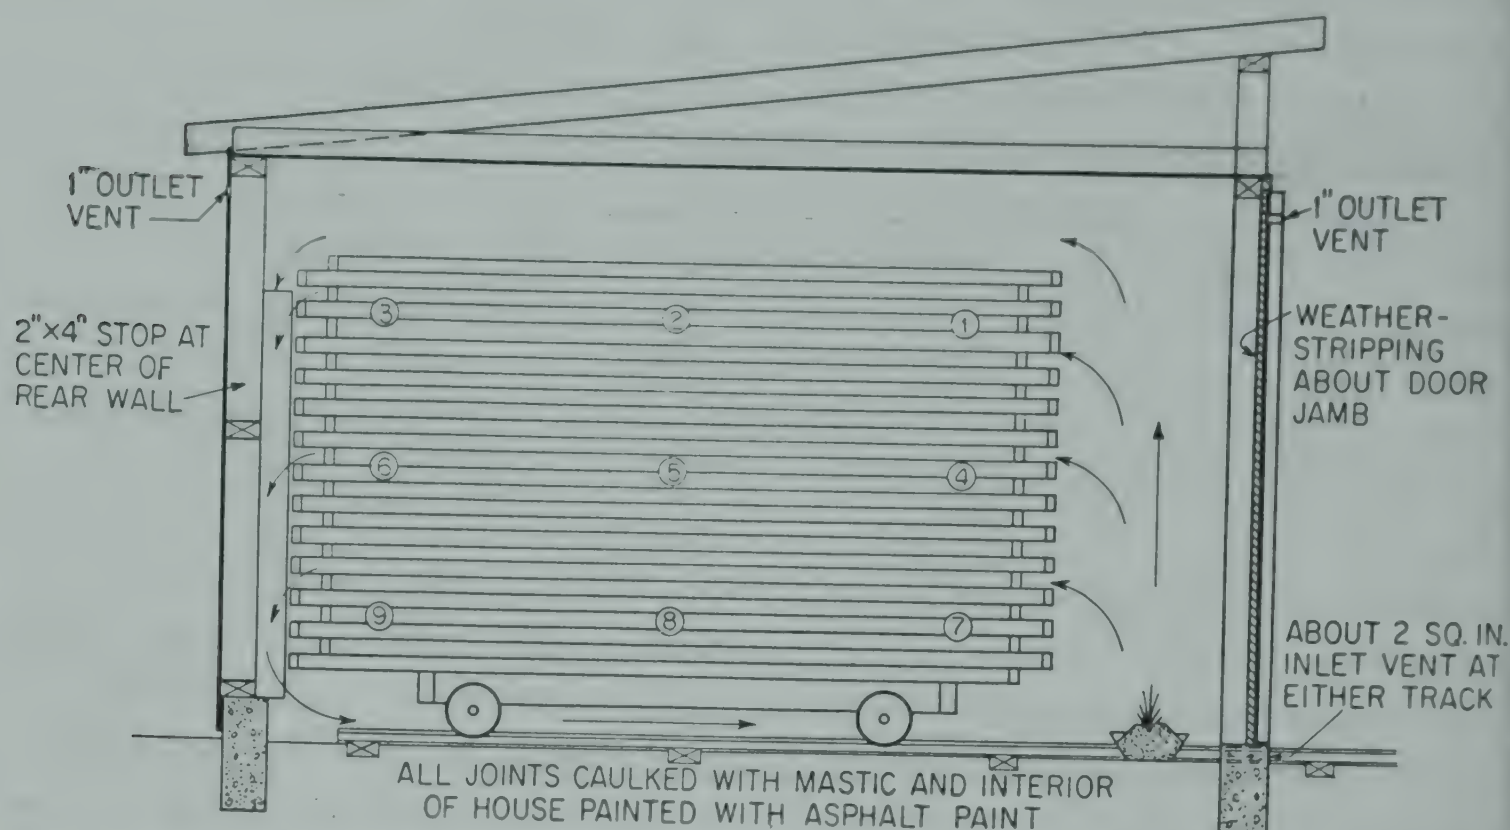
Longitudinal section of a sulfur house, showing a car loaded with sun-drying trays, the location of the sulfur burner, and ventilation openings. (After Phaff and Mrak.)
